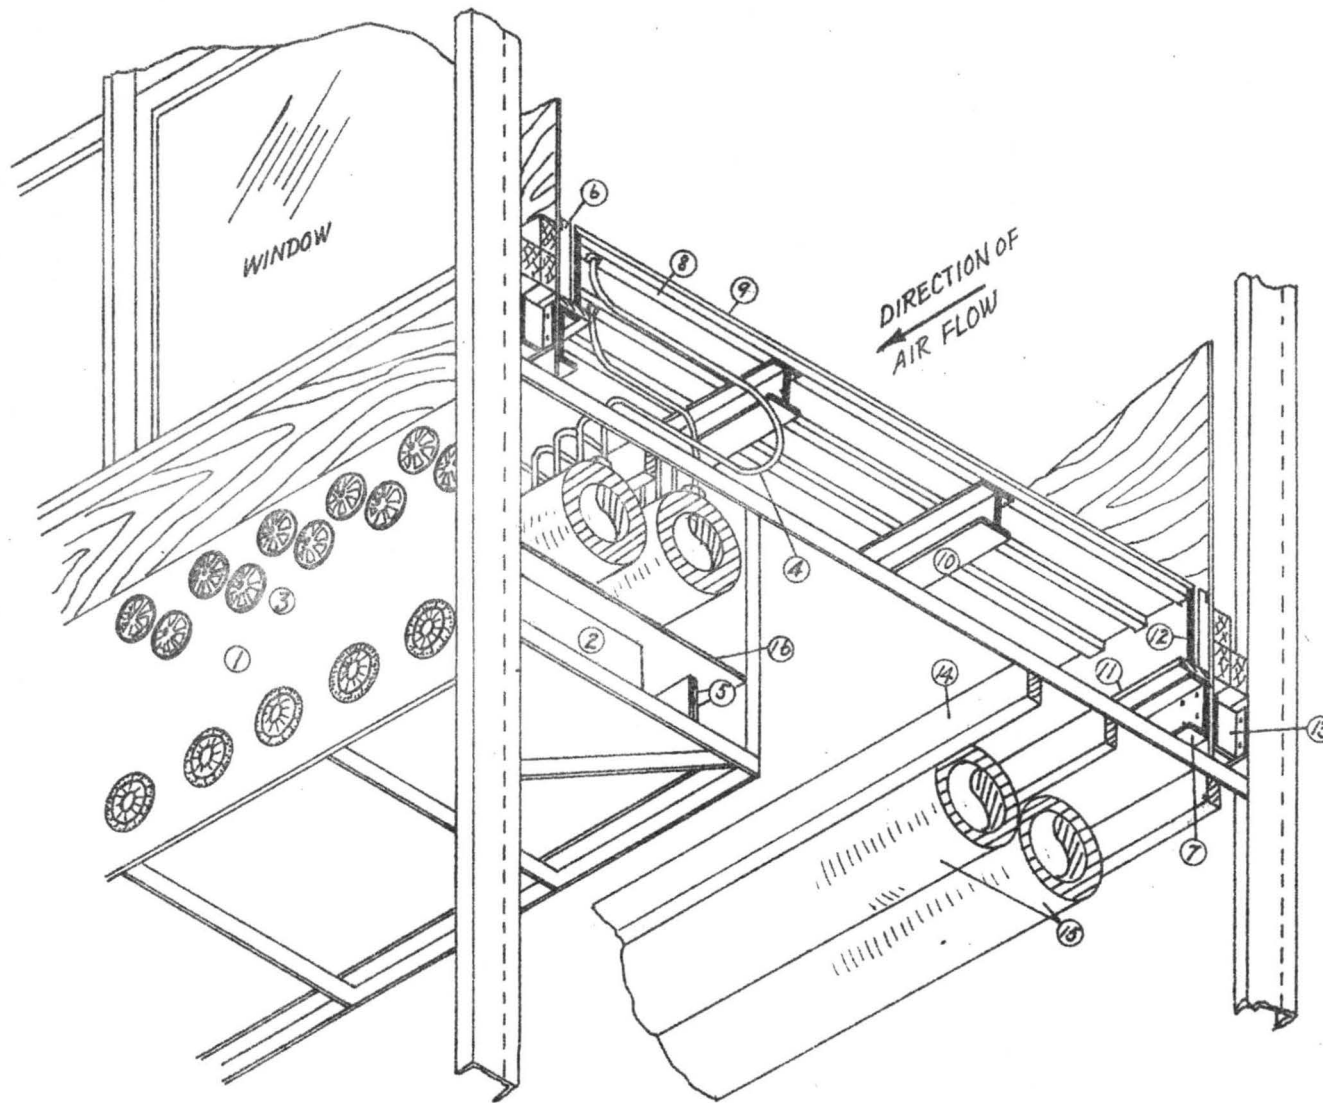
TYPICAL TEST-SECTION CROSS SECTION
